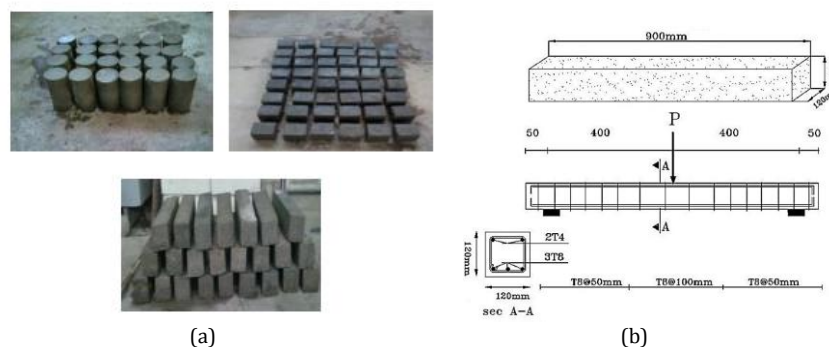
Different Test specimens (mechanical and structural): a) Non-reinforced mechanical strength specimens, b) Structural flexural beam specimen details
